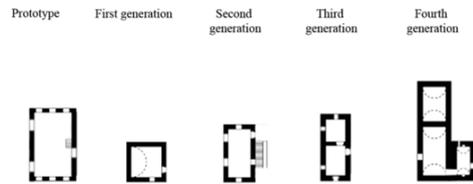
Sketch of layout categorization for residential buildings (Sketch by the author 2020)
